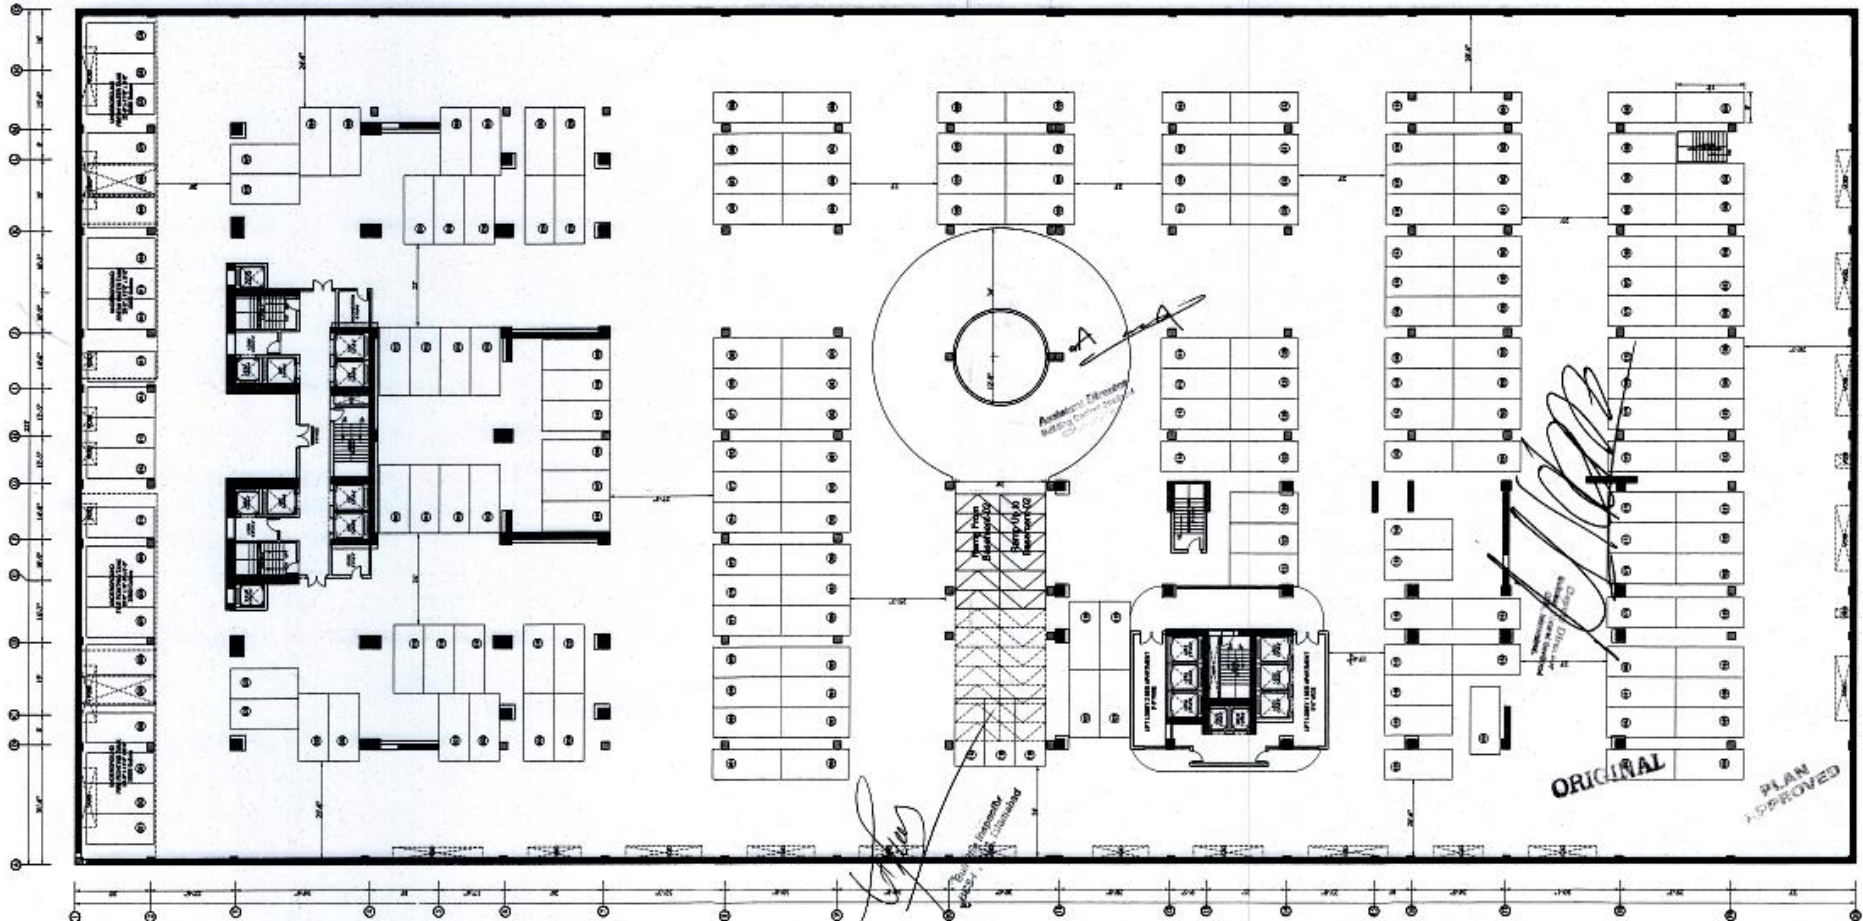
Layout Plan of Ground Floor of The Garden Residence Project, Sector F-10 Markaz, Islamabad
